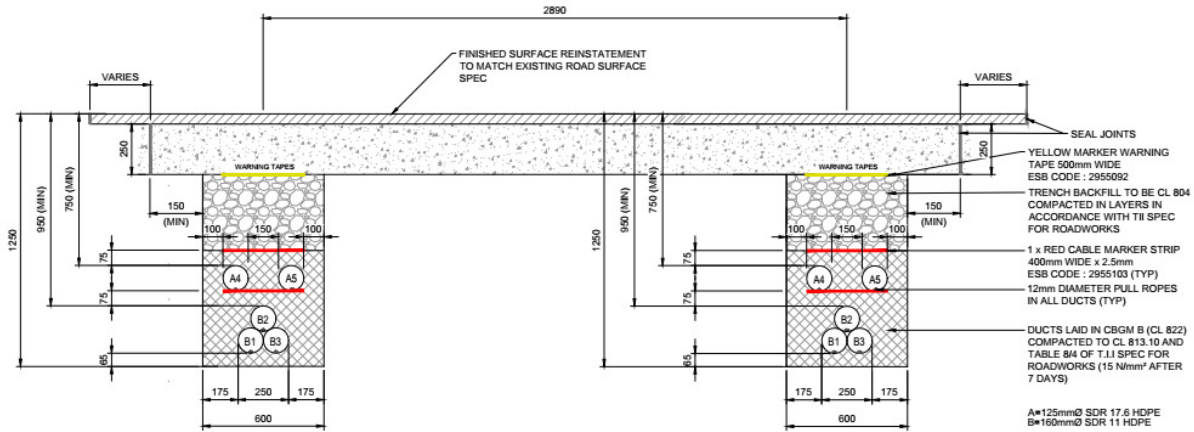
Typical cross-section of HV transmission line trench from the Castlebaggot - Kilmahud Circuit to the proposed Peamount substation within main site (Source: Drawing no. 20_147-CSE-GEN-00-XX-DR-C-2130, CSEA Consulting Engineers)
